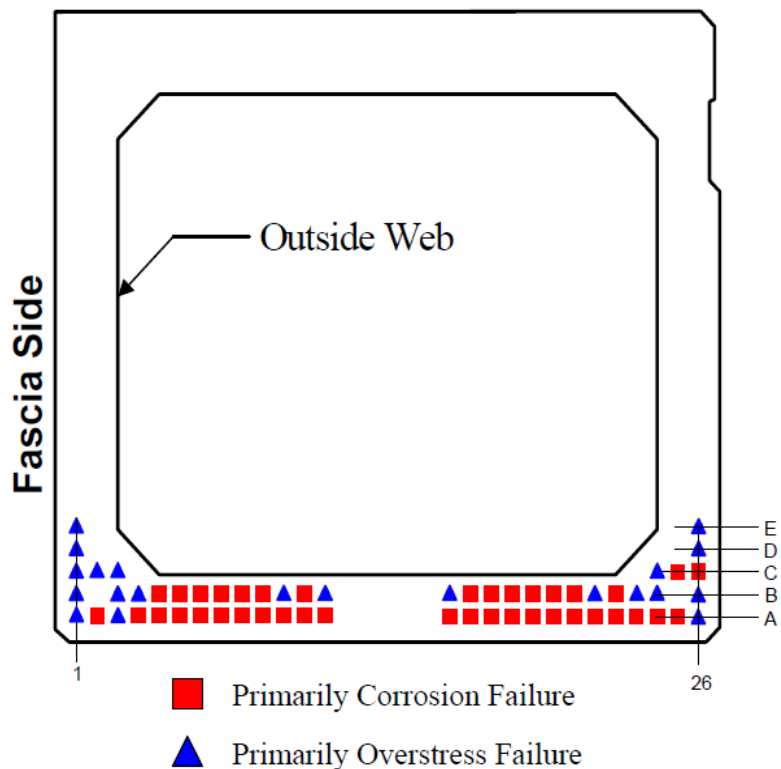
Post-Collapse Prestressing Strand Wire Fracture Laboratory Assessment
